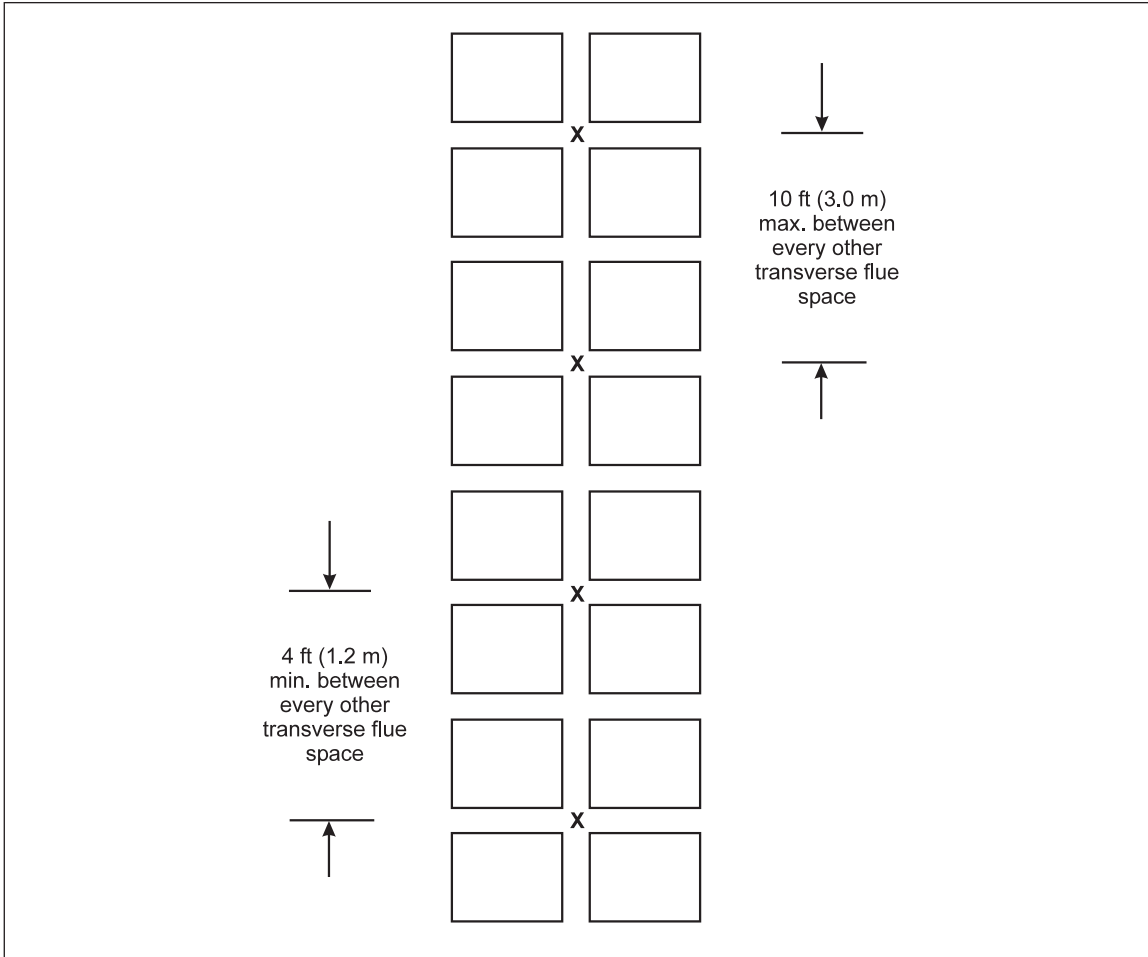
Plan view of IRAS(EO) in-rack sprinkler arrangement for double-row racks
